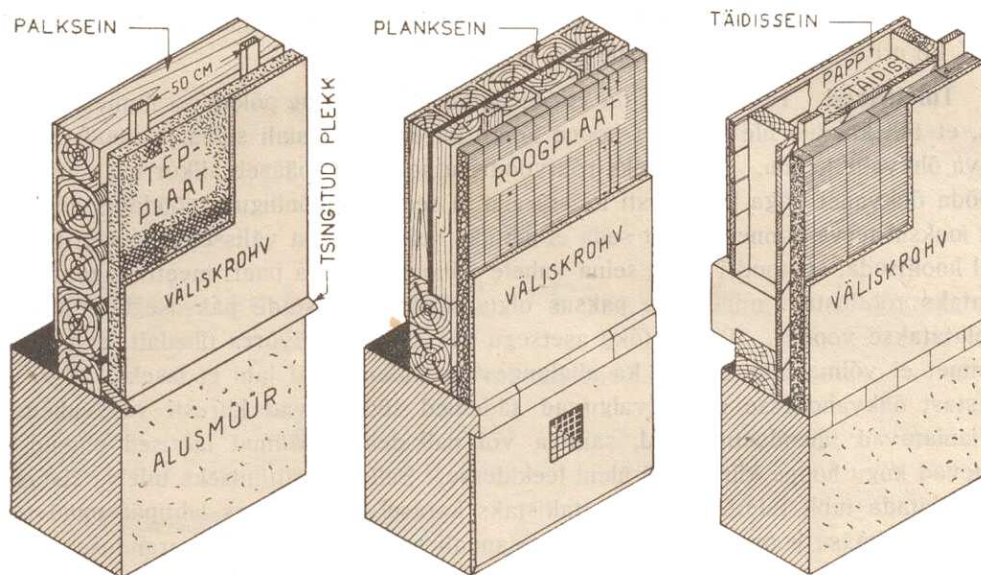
Sections of typical external walls of studied wooden apartment buildings.
